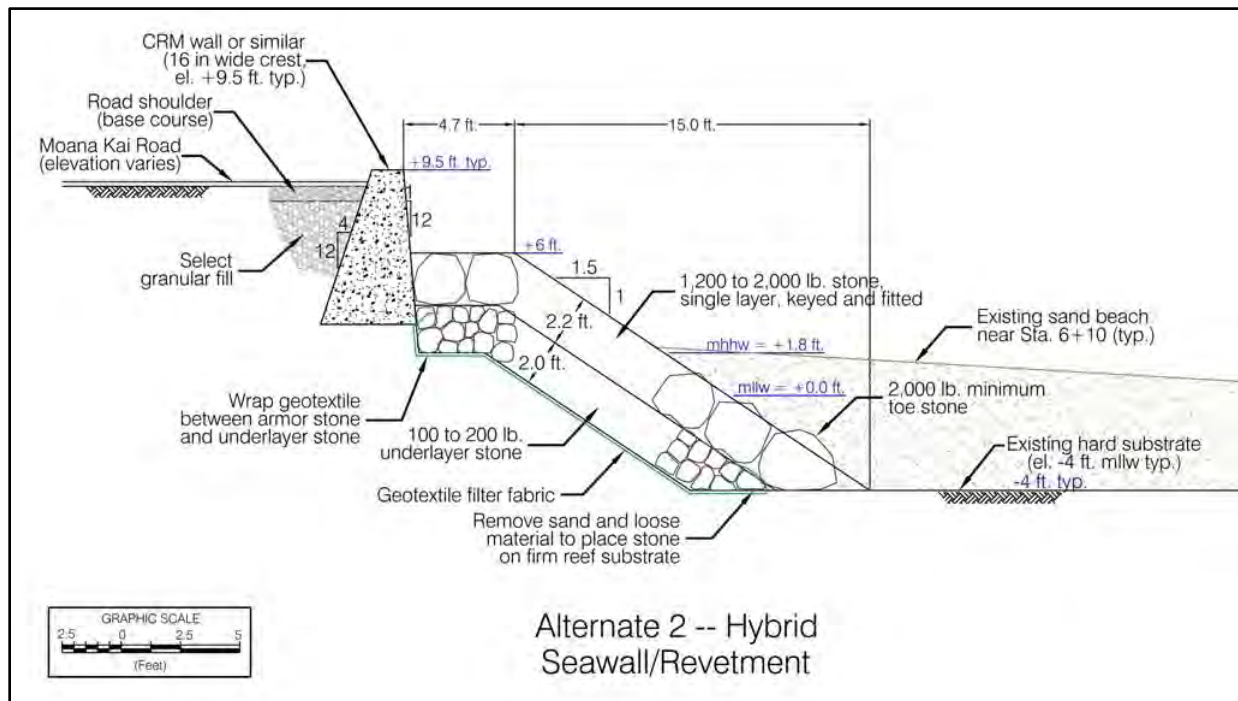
Alternate 2 hybrid seawall/revetment cross section
